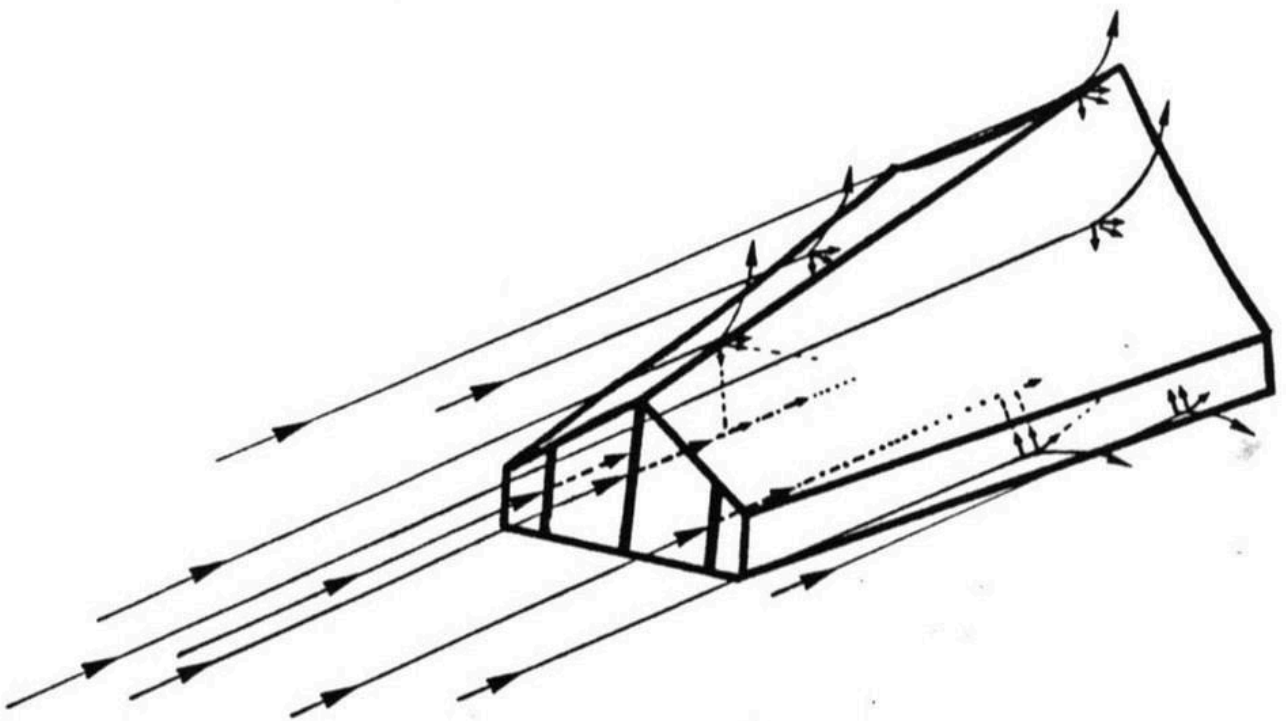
WIND PRESSURES ON A TRAPEZIUM-SHAPED HOUSE.
